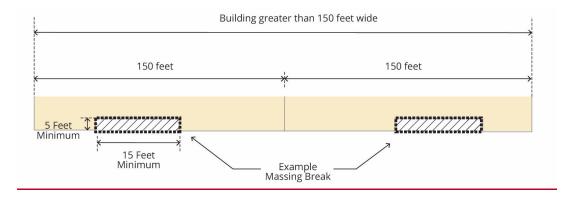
C MIXED USE BUILDINGS, MASSING INCREMENT
